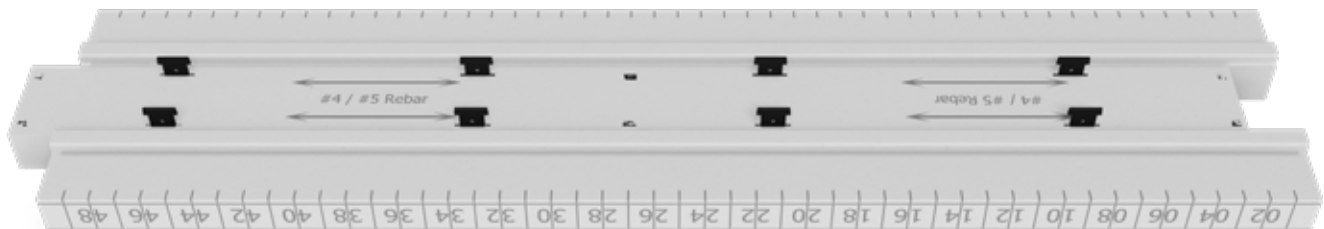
BuildBuck bottom showing cut lines, alignment rails, and "T" anchors for concrete attachment.
